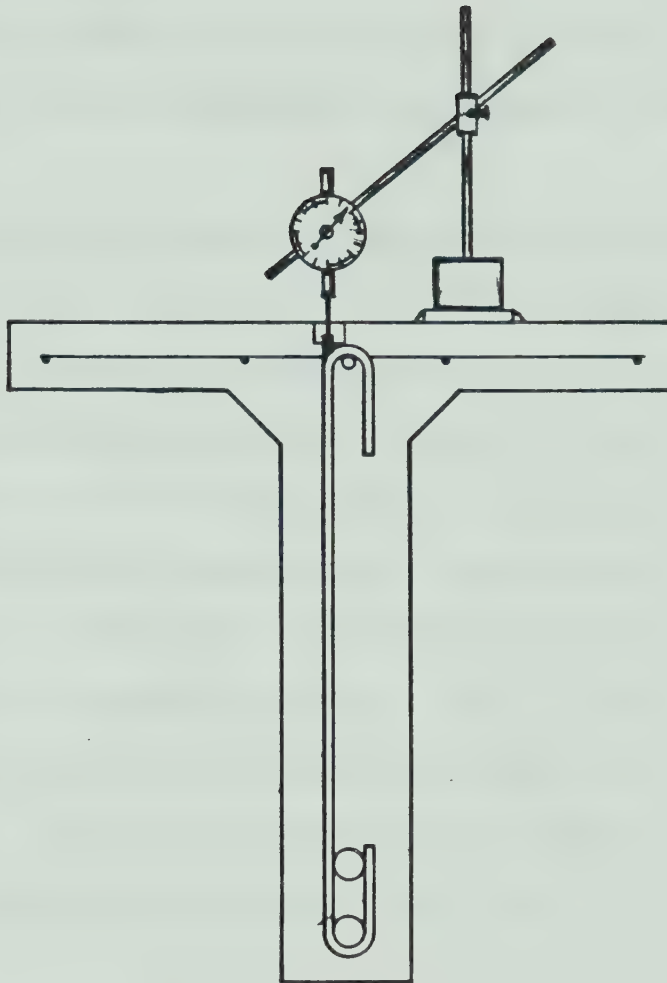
Mounting of Dial Gauge Apparatus for Measuring Stirrup Slip
